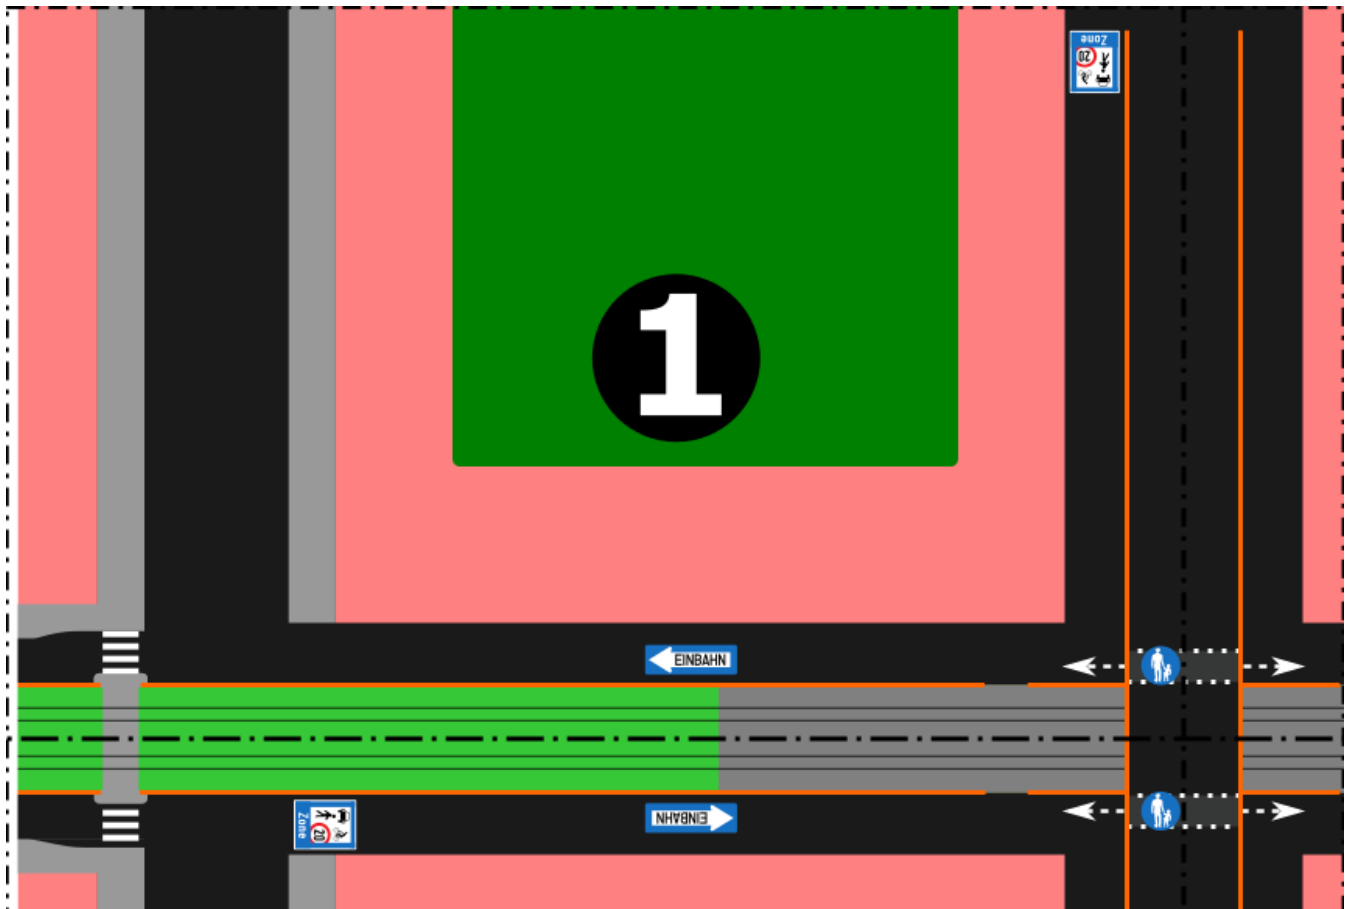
Detailed ground plan of an LCRT line with a shallow underpass
